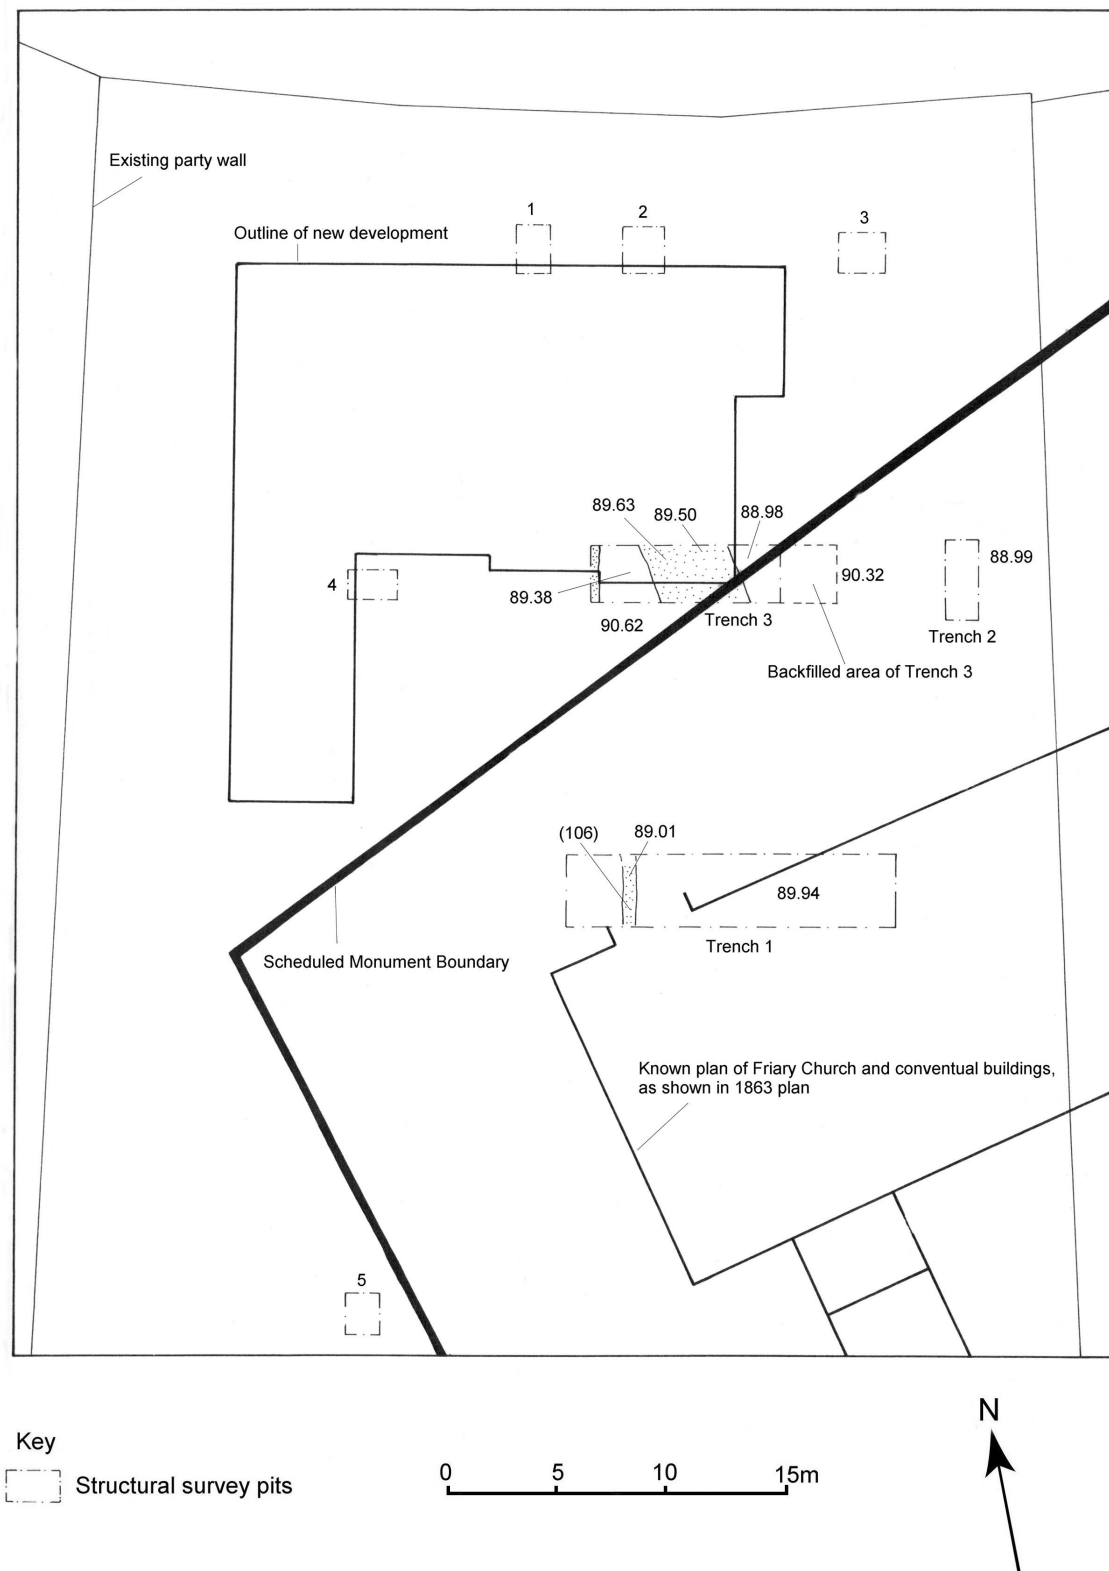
Layout of trenches and structural survey pits with plan of Friary Church superimposed
